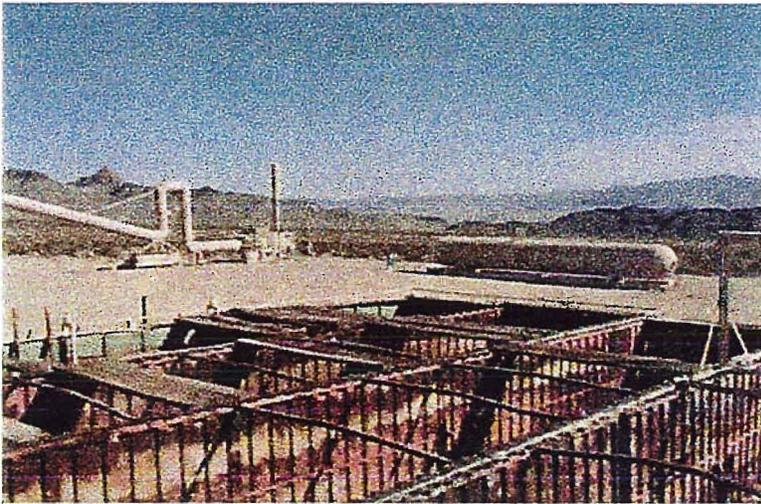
Looking northeast across the Phoenix R. & D. #VIII mill site. Shows scrubbers and propane tank in background. Foreground is metal storage units prior to being roofed. Taken by J. Mur 10/22/97.
